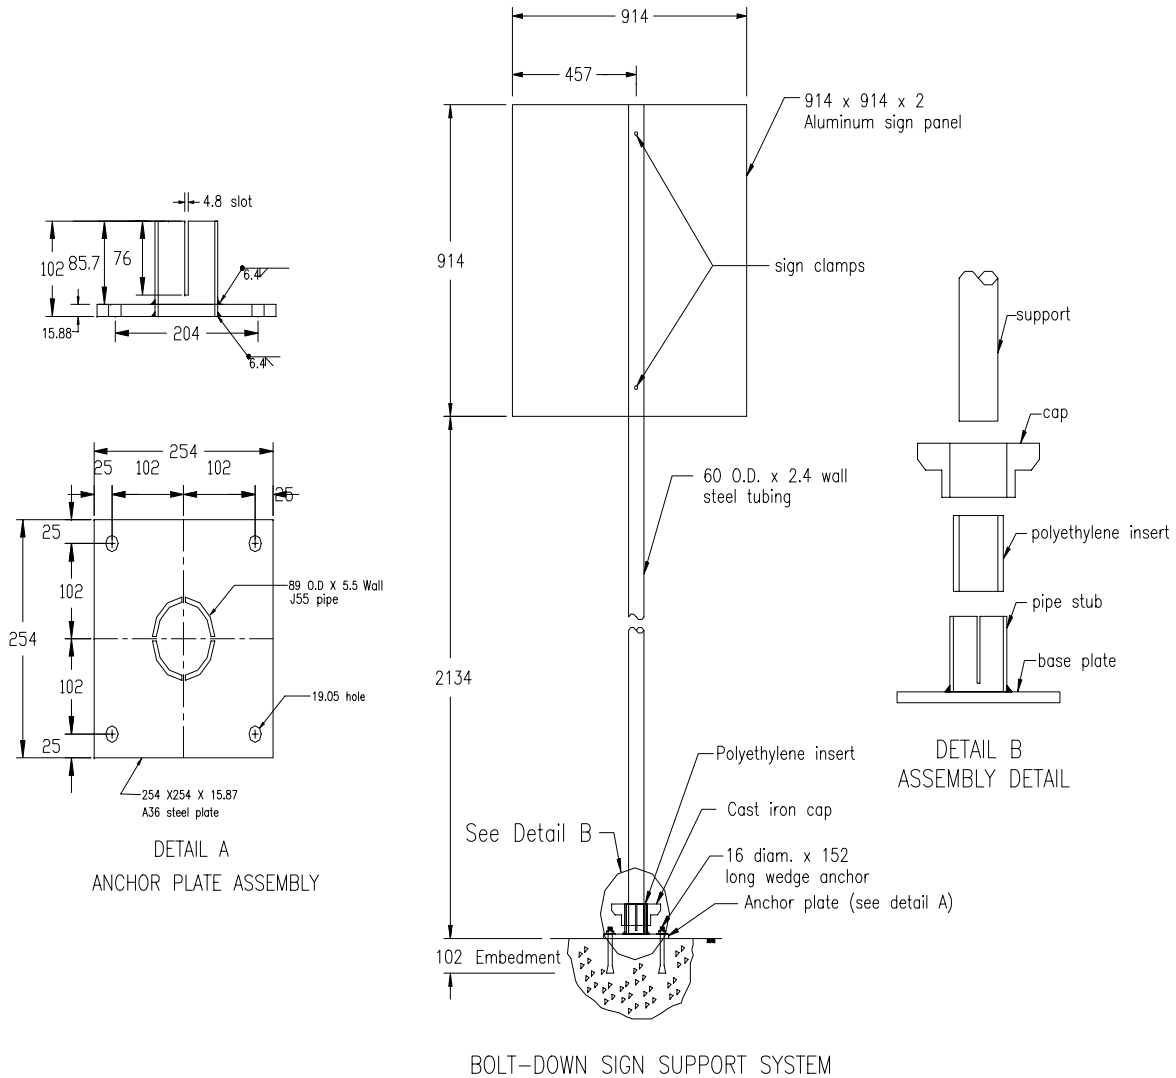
Details of the Installation Used for Evaluation of Support Bases Bolted to Concrete Pavement in Test 439117-7.
